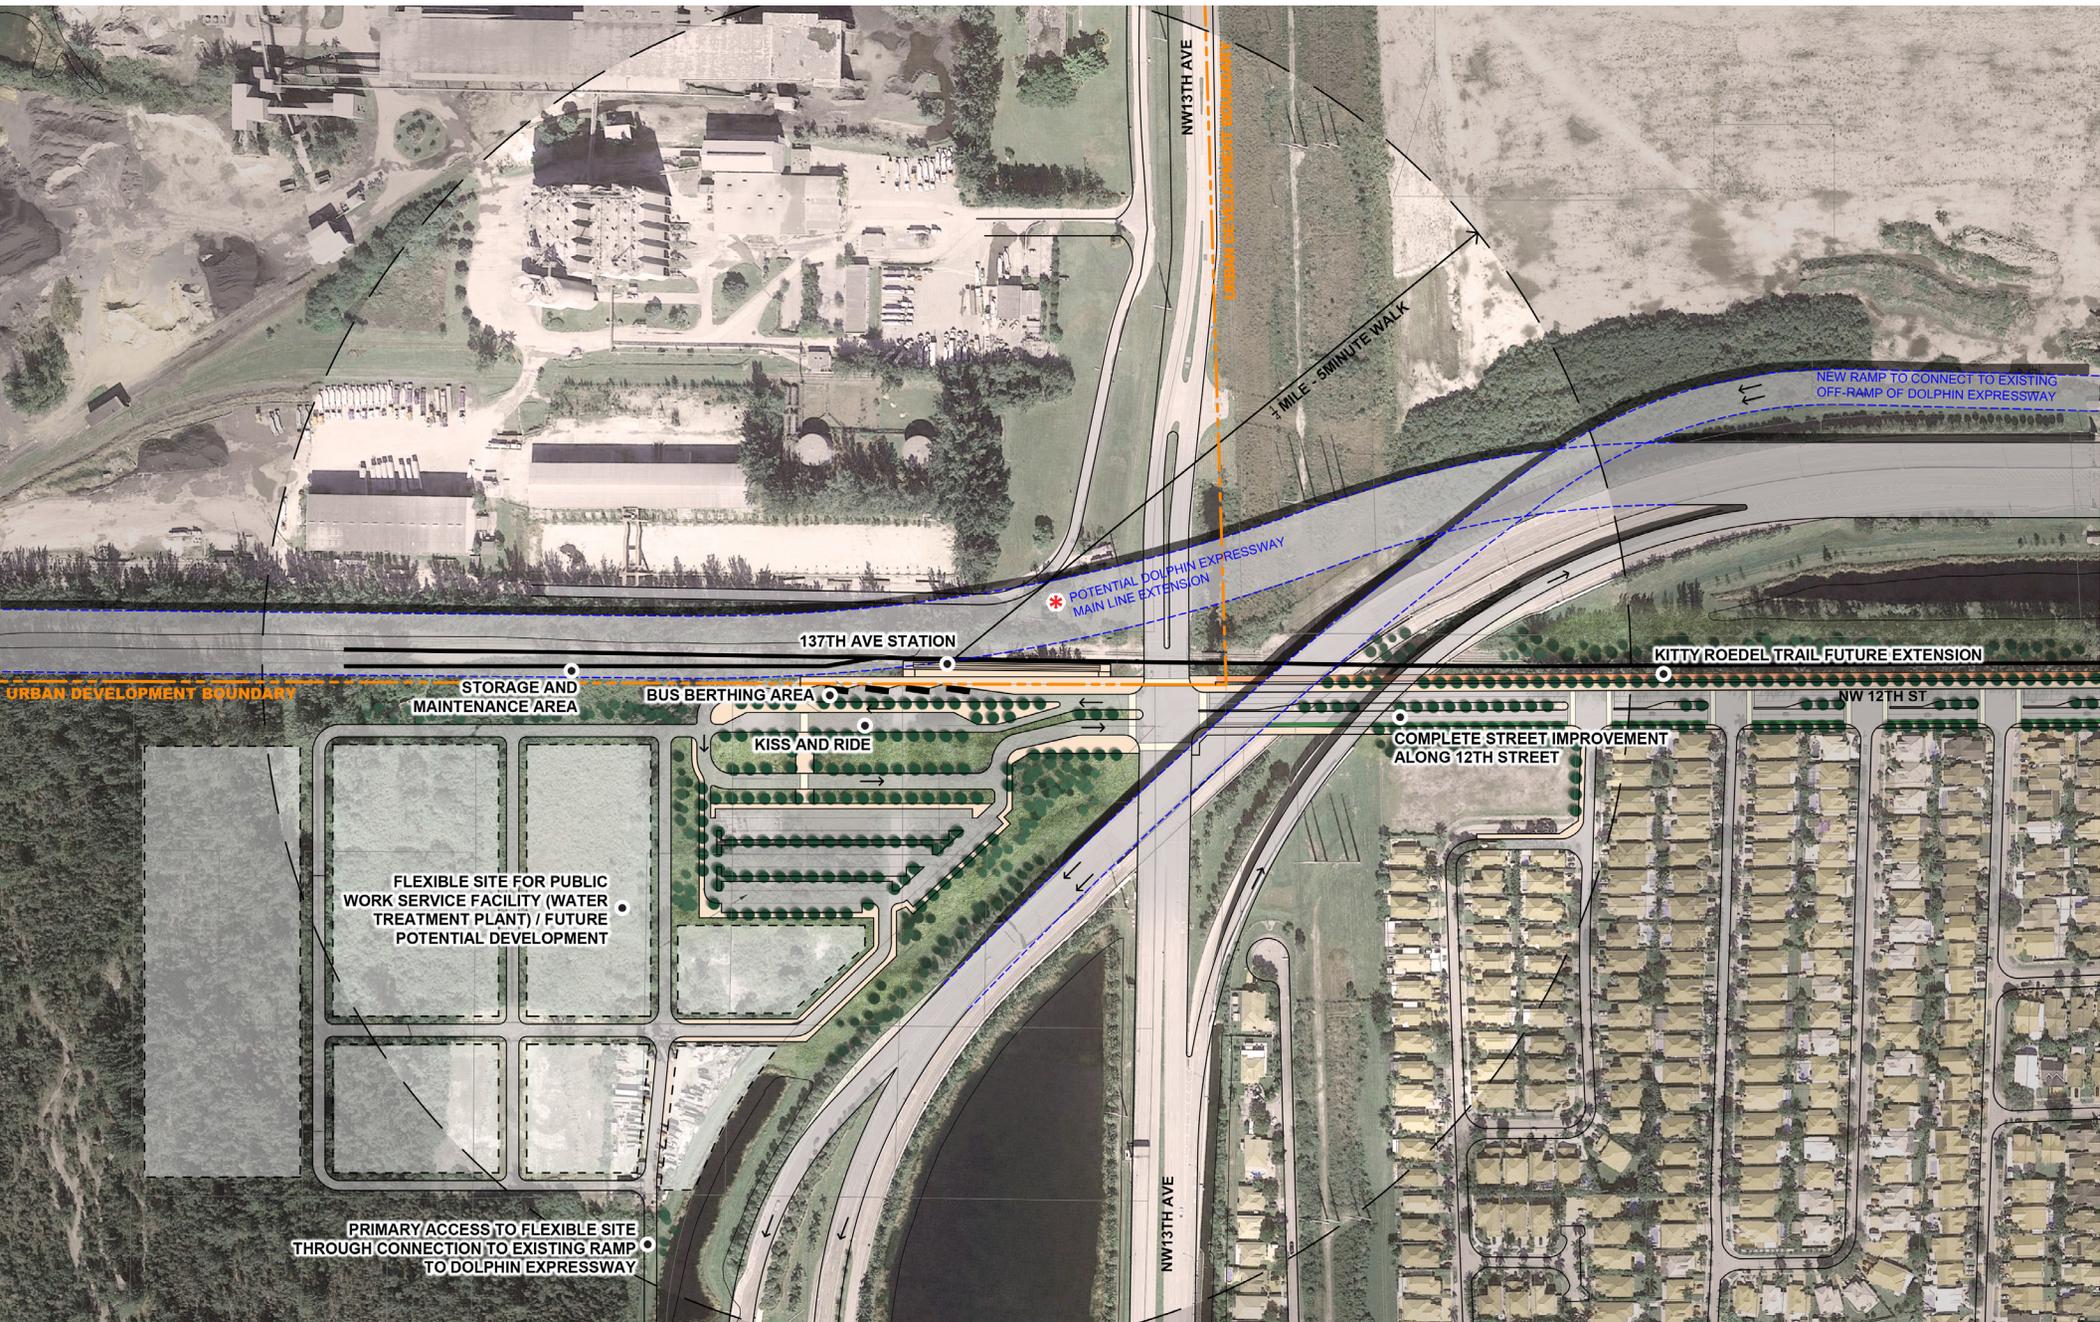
NW 137th Avenue Station TOD Concept Layout
